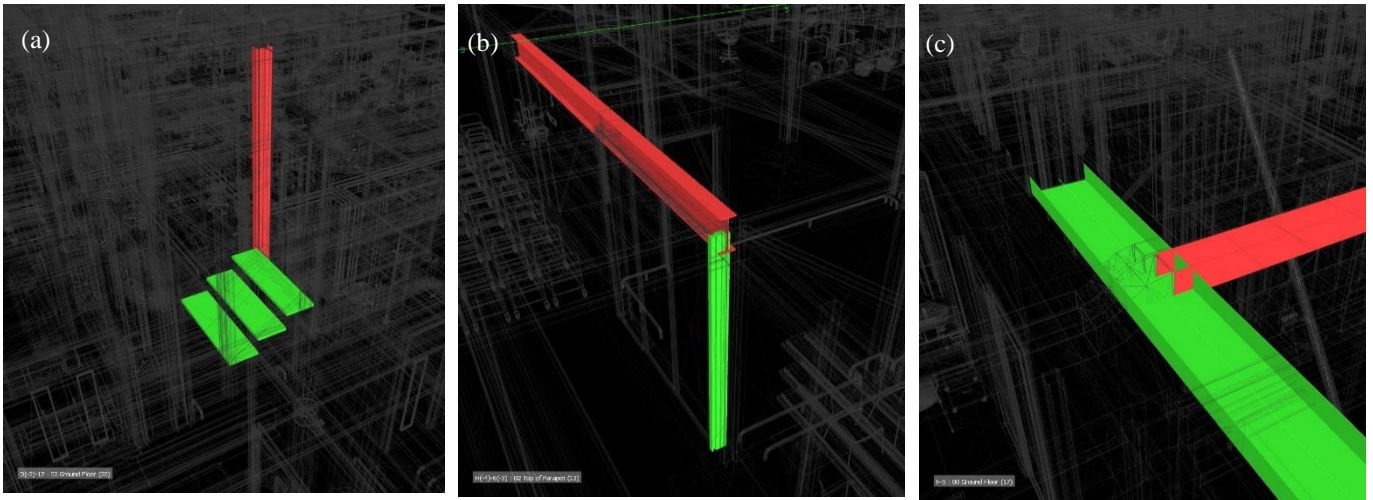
Naviswork output showing design clashes resulting due to merging of civil engineering building design models: (a) clash between architectural stairs and structural steel PFC column, (b) confrontation issue between main steel beam and trimming steel around the door, and (c) cable tray clash against mechanical ducting.
